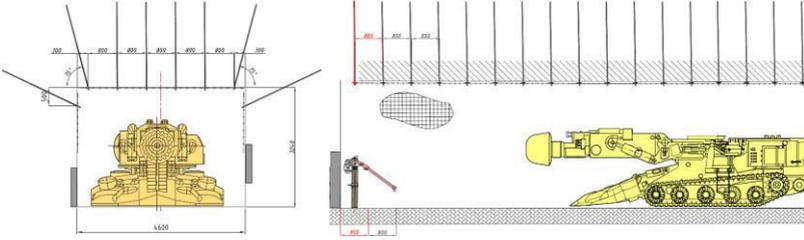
Typical scheme of the roof bolting for roadways with rectangular cross-section
